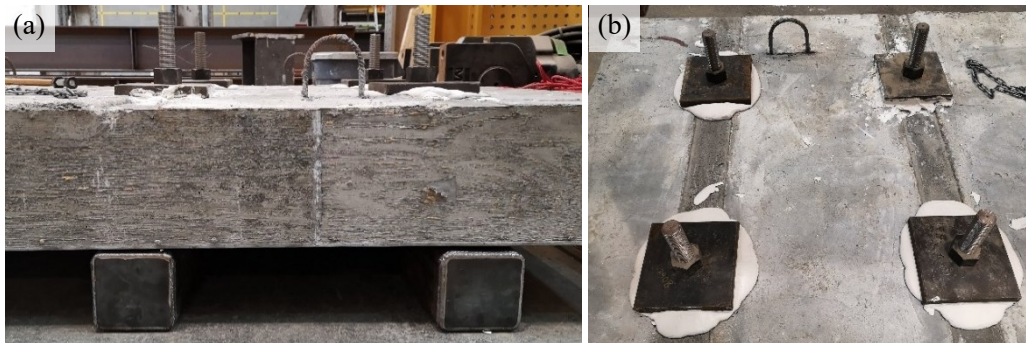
(a) Structure mounted over HSS profiles, (b) typical treatment used to anchor specimens to strong floor.
